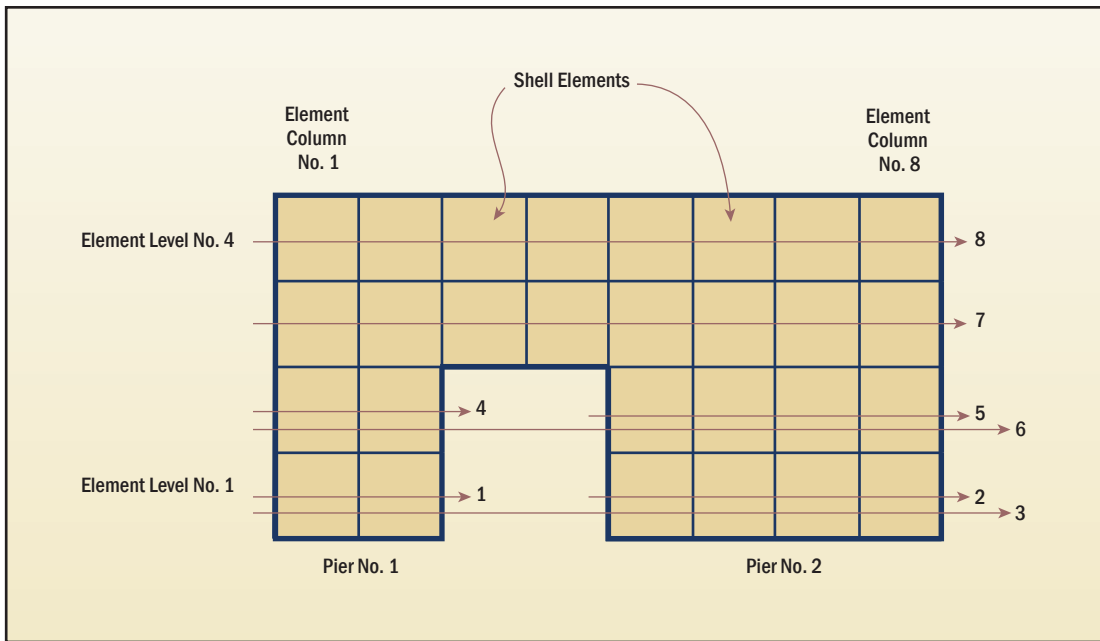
Elevation of Shear Wall with One Opening, Showing Horizontal Groups
